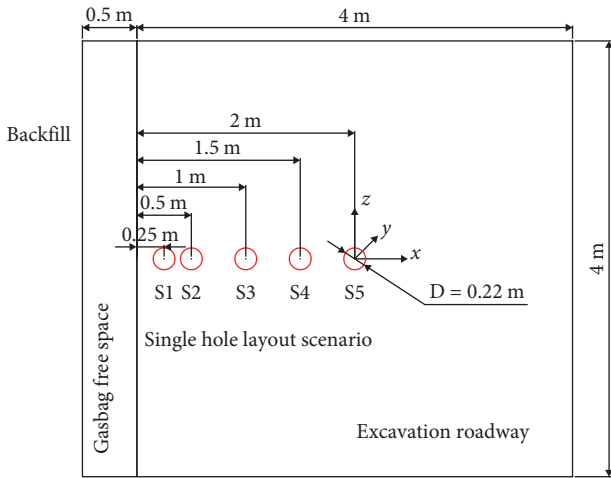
Layout scenario of single-hole mechanical fracturing.
